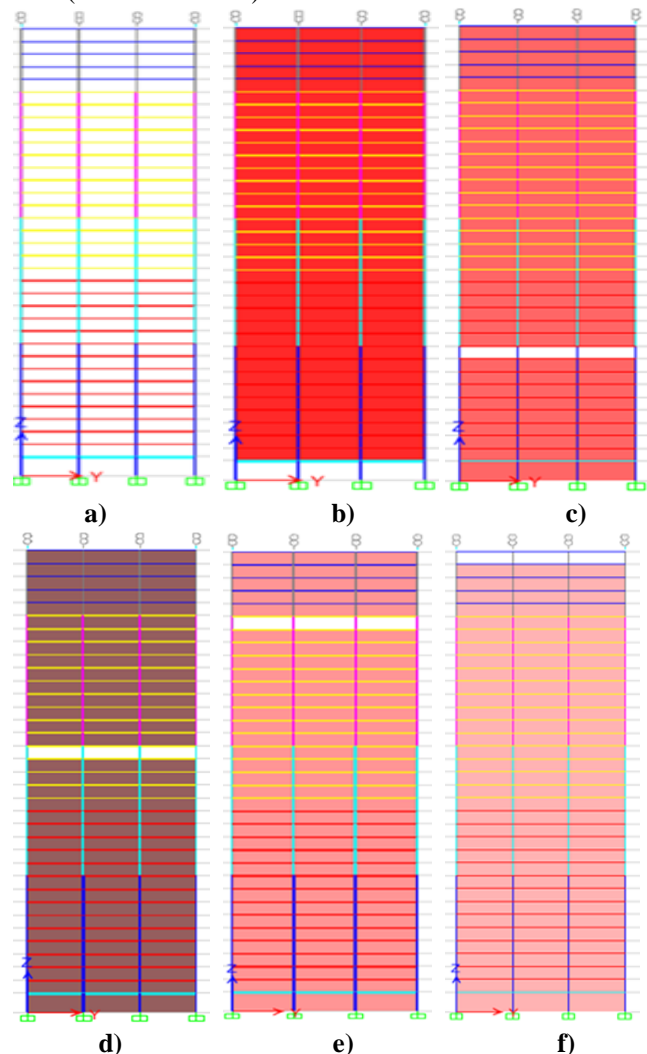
a) Elevation of BFM, b) Elevation of M1 model, c) Elevation of M2 model, d) M3 Elevation, e) M4 Elevation, f) M5 model Elevation.
